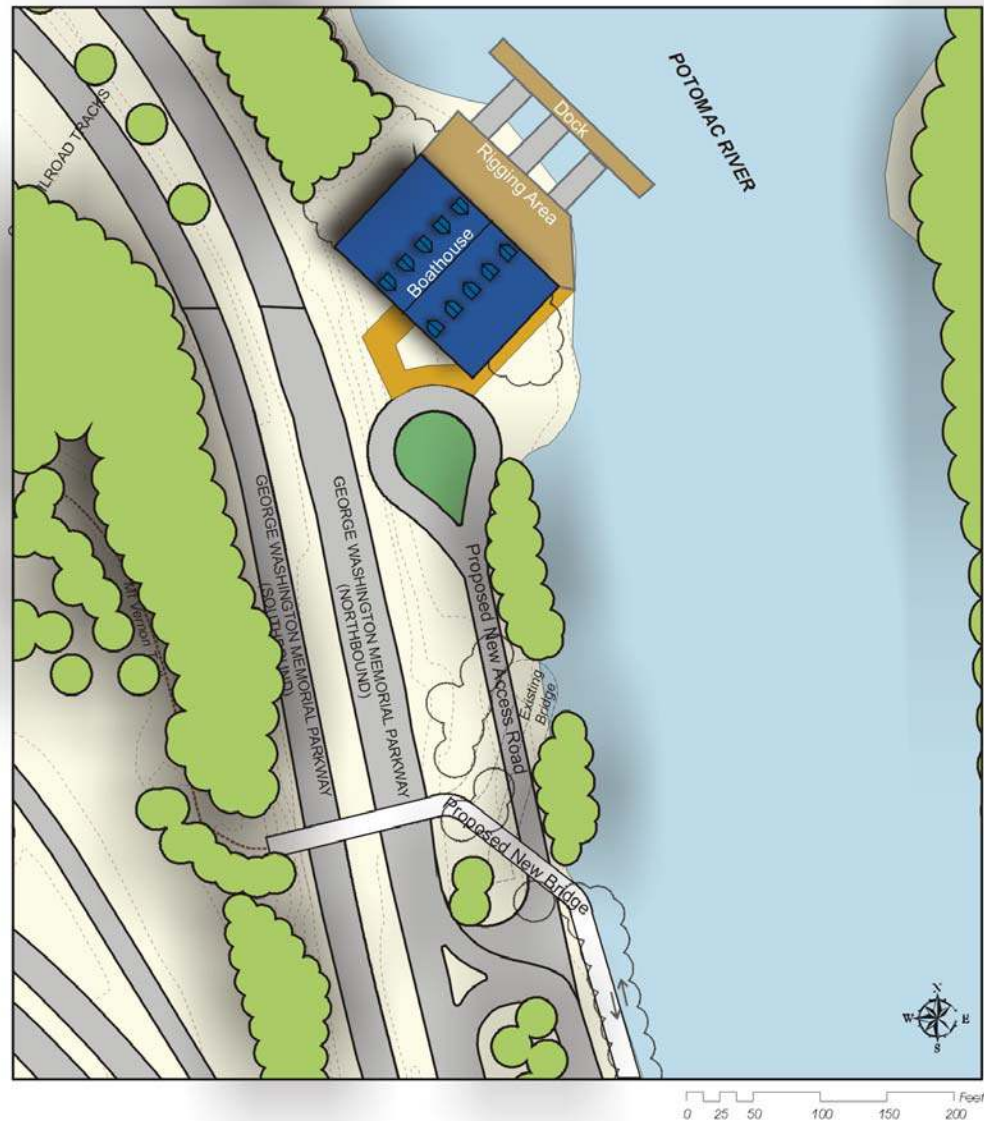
Conceptual Site Plan, Maximum Program Boathouse
